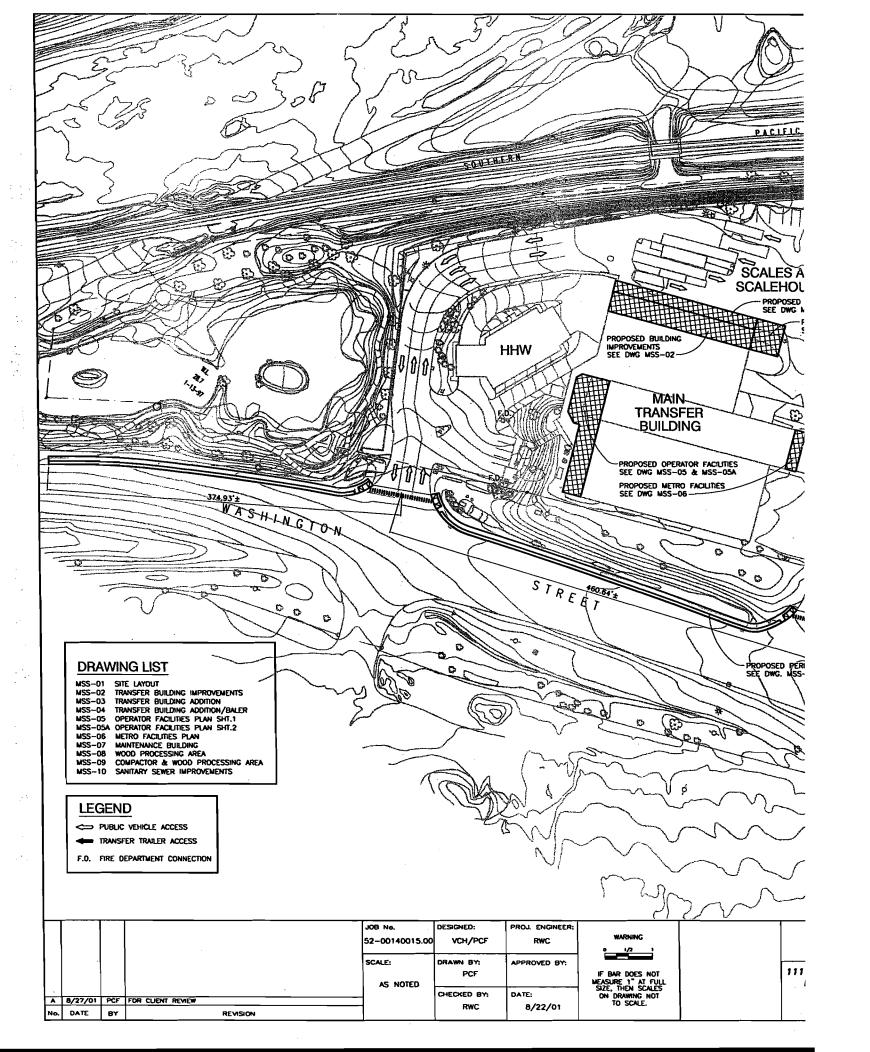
is a site vicinity map. Drawing MSS-01 illustrates the current site layout and recent improvements.
